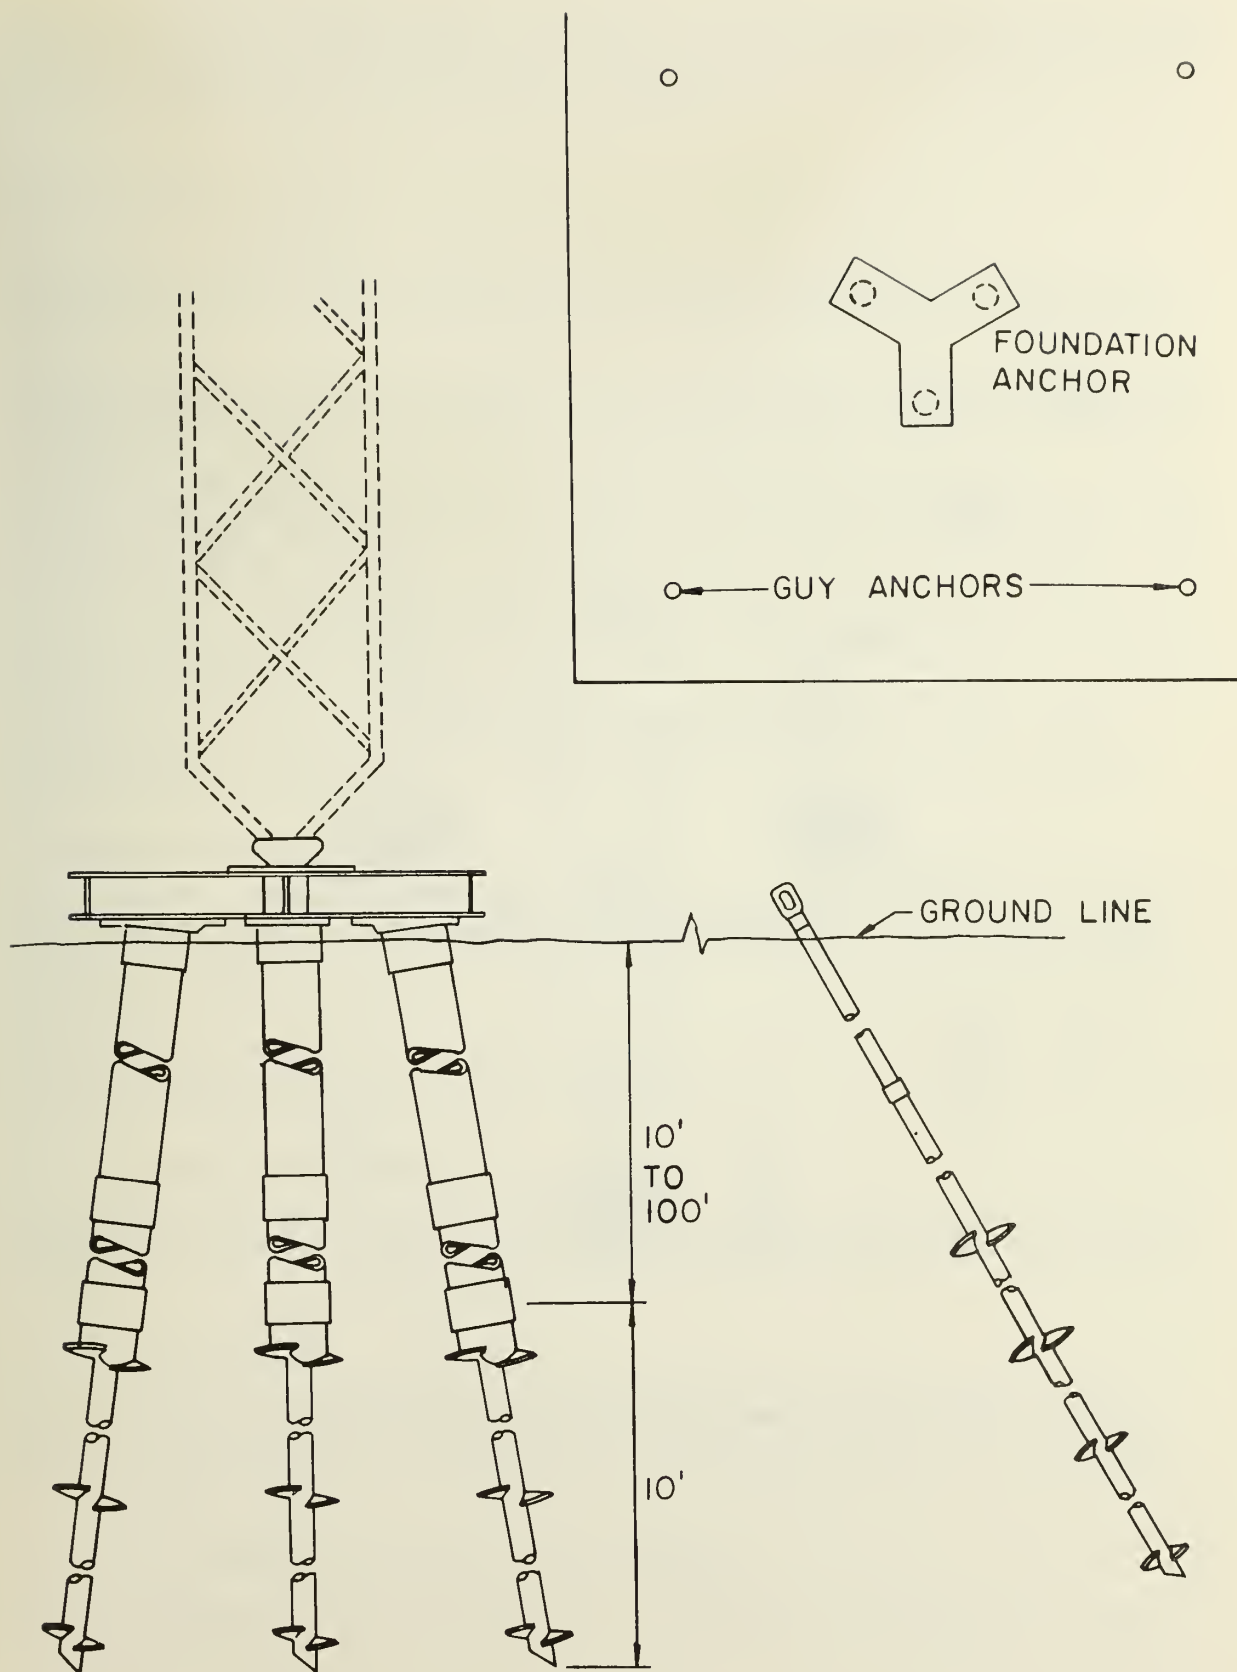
Foundation Anchor Assembly for the Guyed Aluminum Structure.
